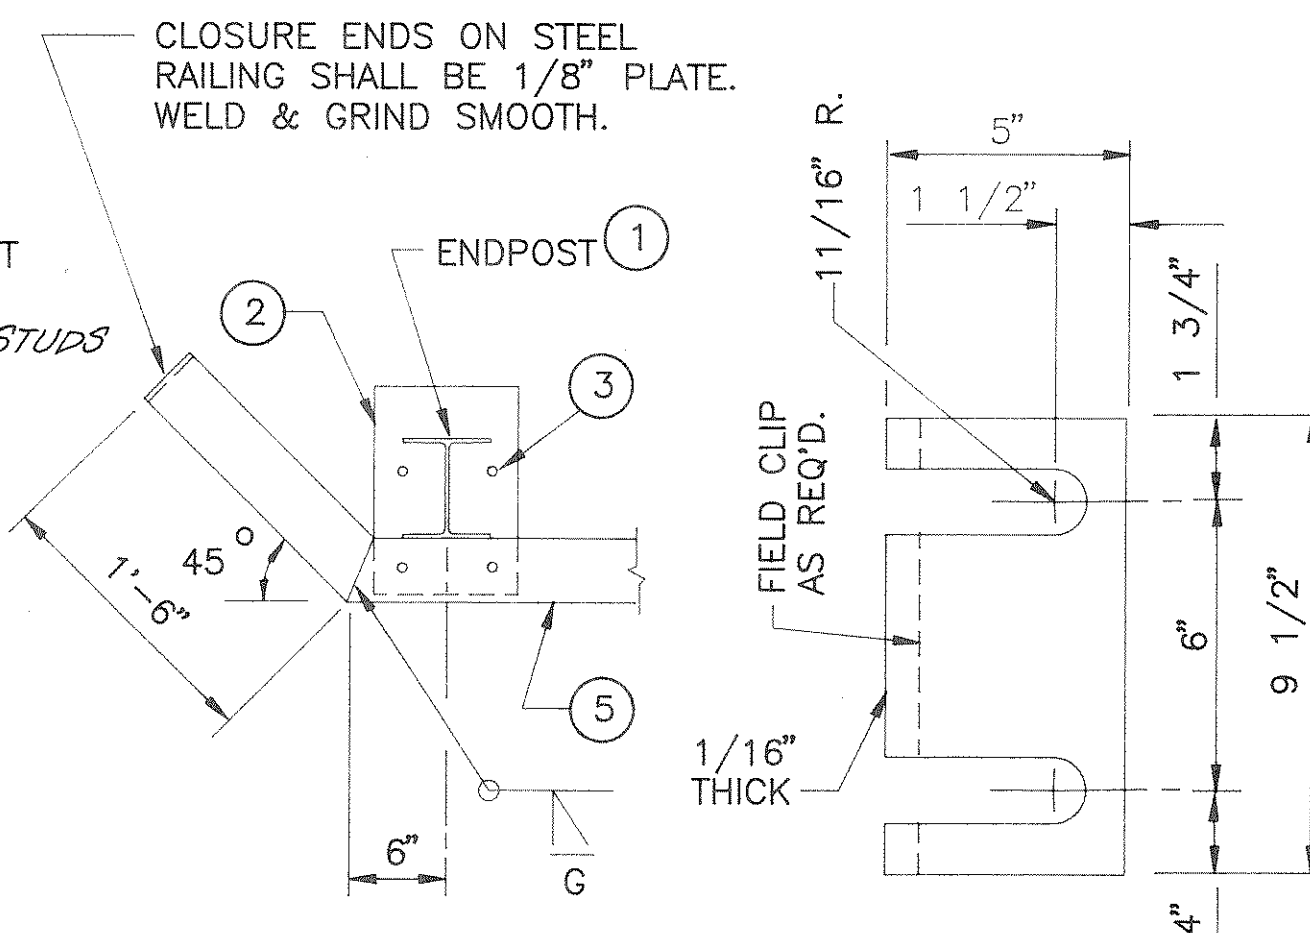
DETAIL AT END POST (PLATE BEAM GUARD RAIL ATTACHMENT)
